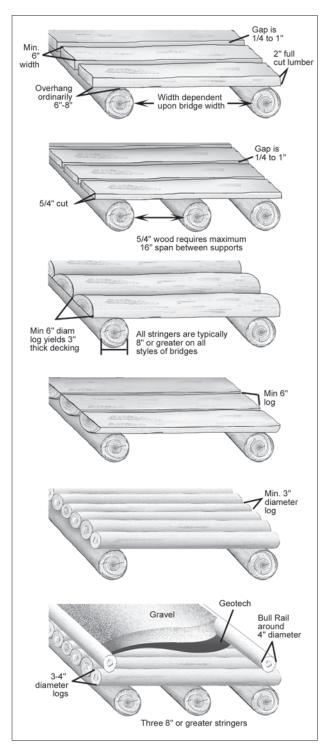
Examples of alternative bridge decking characteristics that reflect CCC era bridges. (Acadia National Park, Barter and Baldyga)
